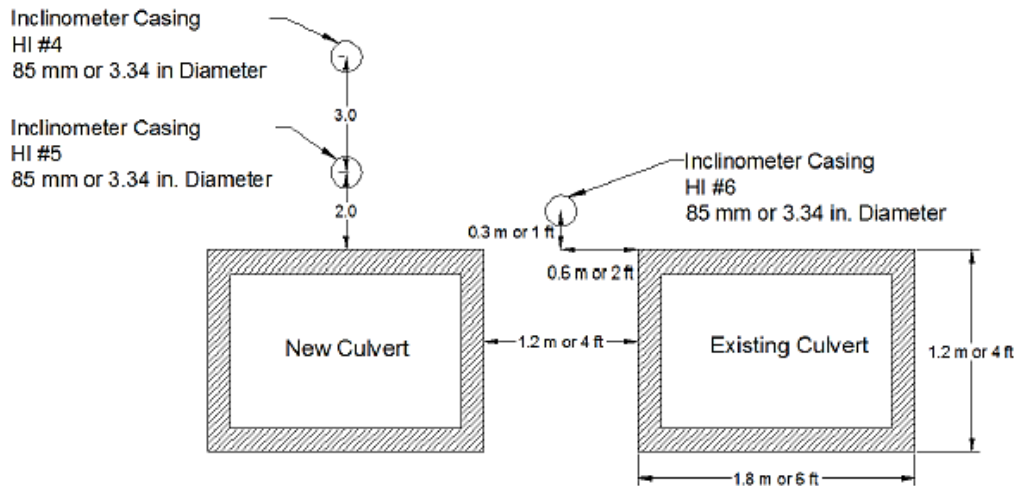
Inclinerometer Installation Plan South Side (Tavakoli, 2012)
